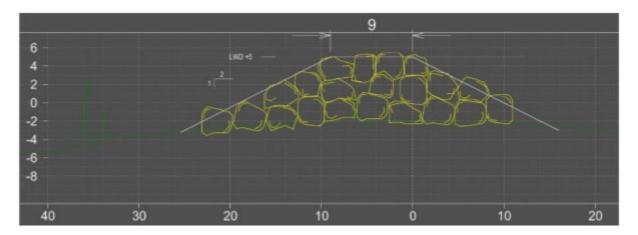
Typical cross-section, West Pier, St. 2+25 - 5+25
